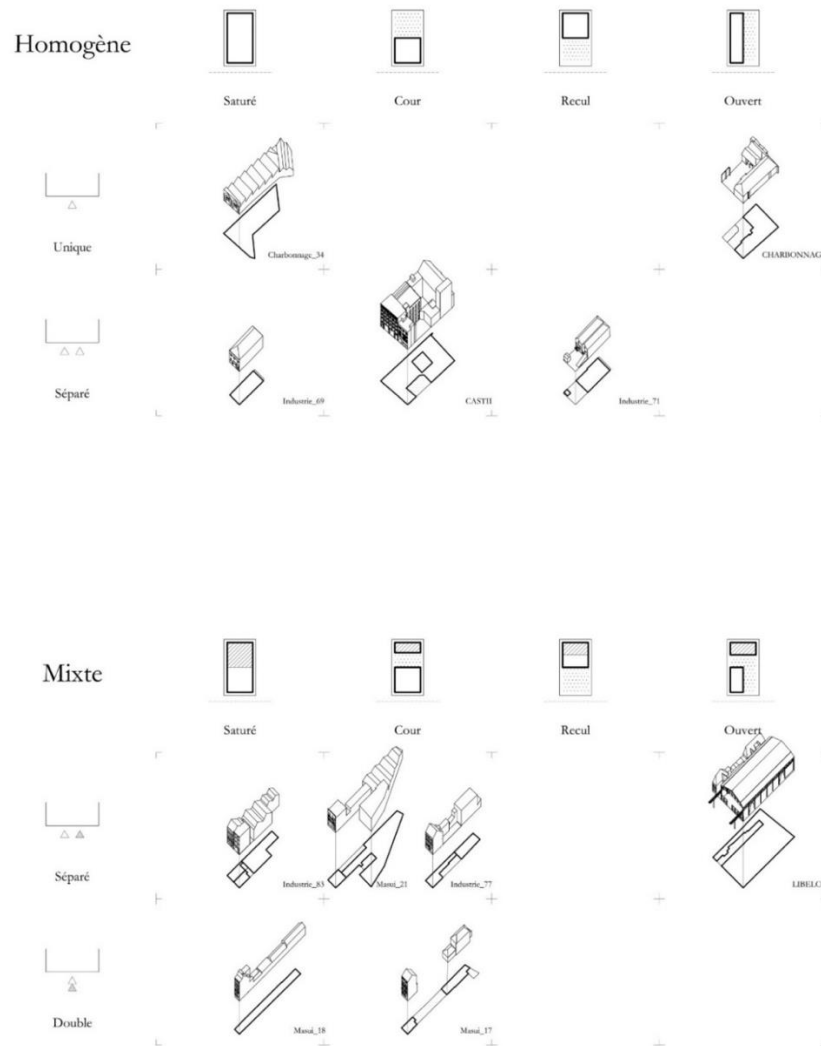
Typological matrix (under construction) based on the two productive building configuration, the three depth configurations, building alignment and plot saturation. Illustration B. Le Fort, 2017
